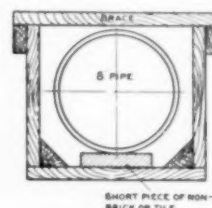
SECTION OF WOODEN FORM USED FOR APPLICATION OF ASPHALT OR CONCRETE COATING
